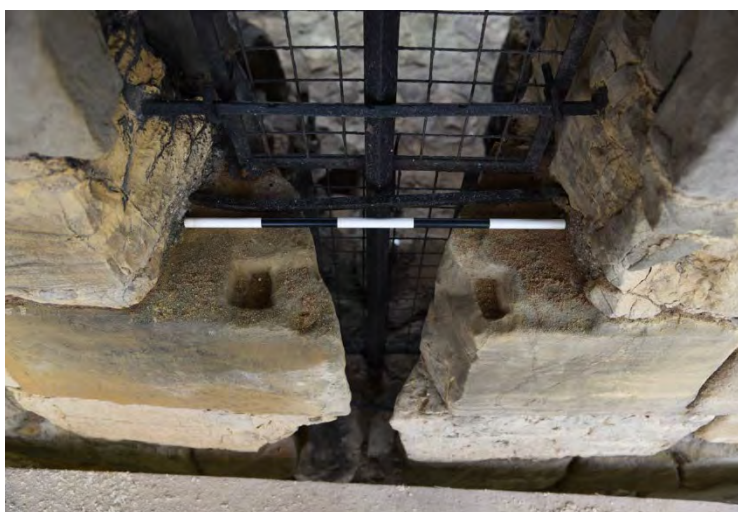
Ground-floor opening on the south lobe showing fixings for ironwork in the bottom of the enlarged opening (Scale 0.5m)
